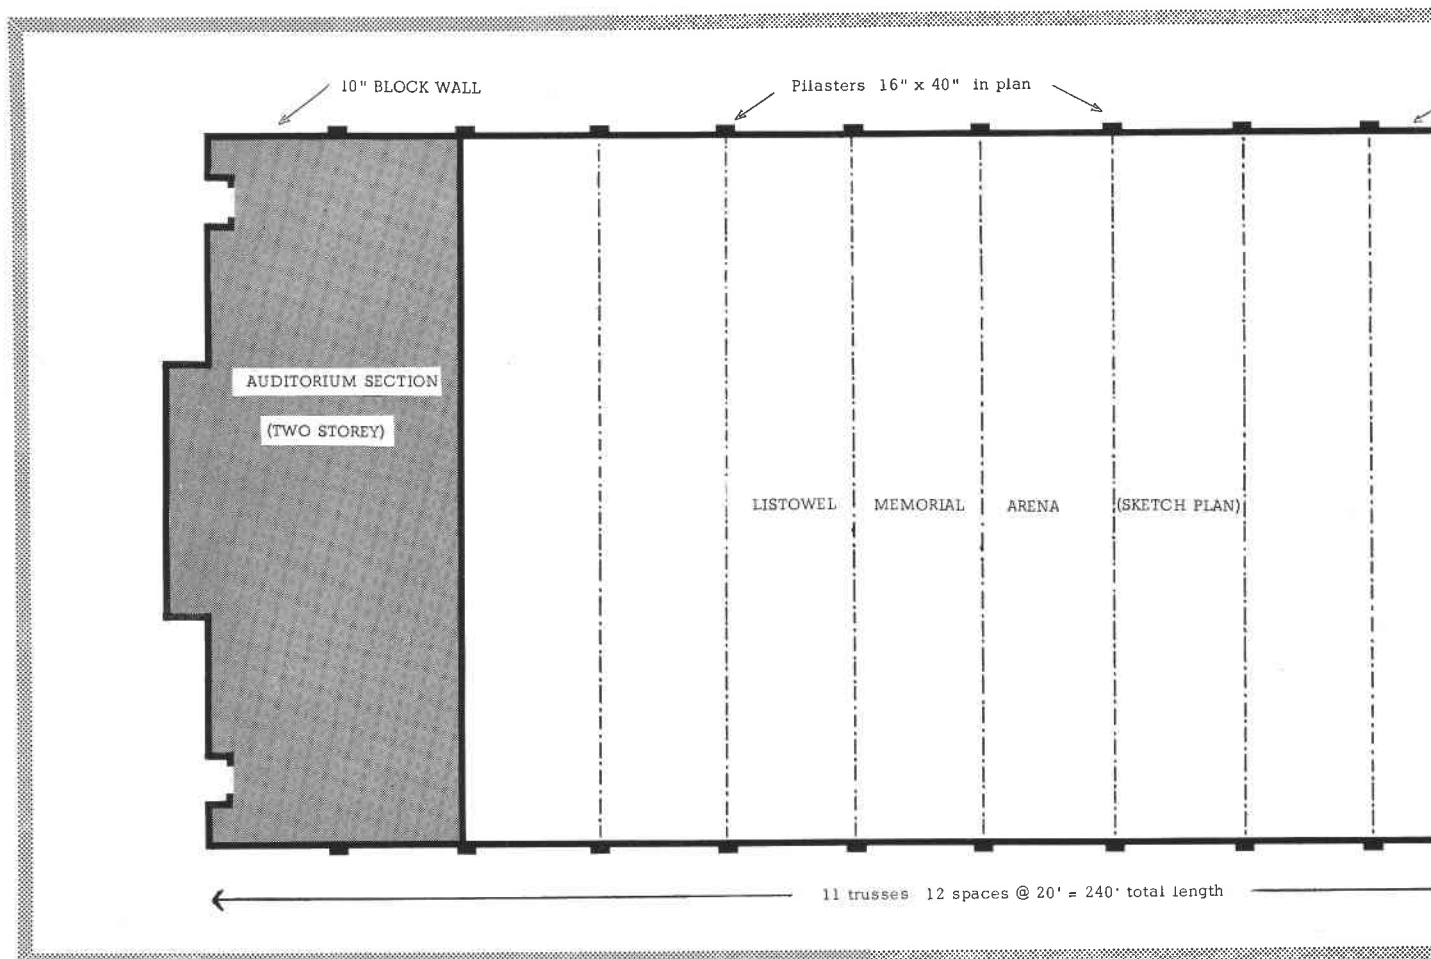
shows a plan view of the building and an elevation of one of the roof trusses. The building was 110 ft. wide and 240 ft. long. The portion of the building over the ice was 200 ft. long and 20 ft. high at the eaves. The remainder of the building, 40' x 110', was two storeys high and housed dressing-rooms, entrance lobbies, services and an as-
